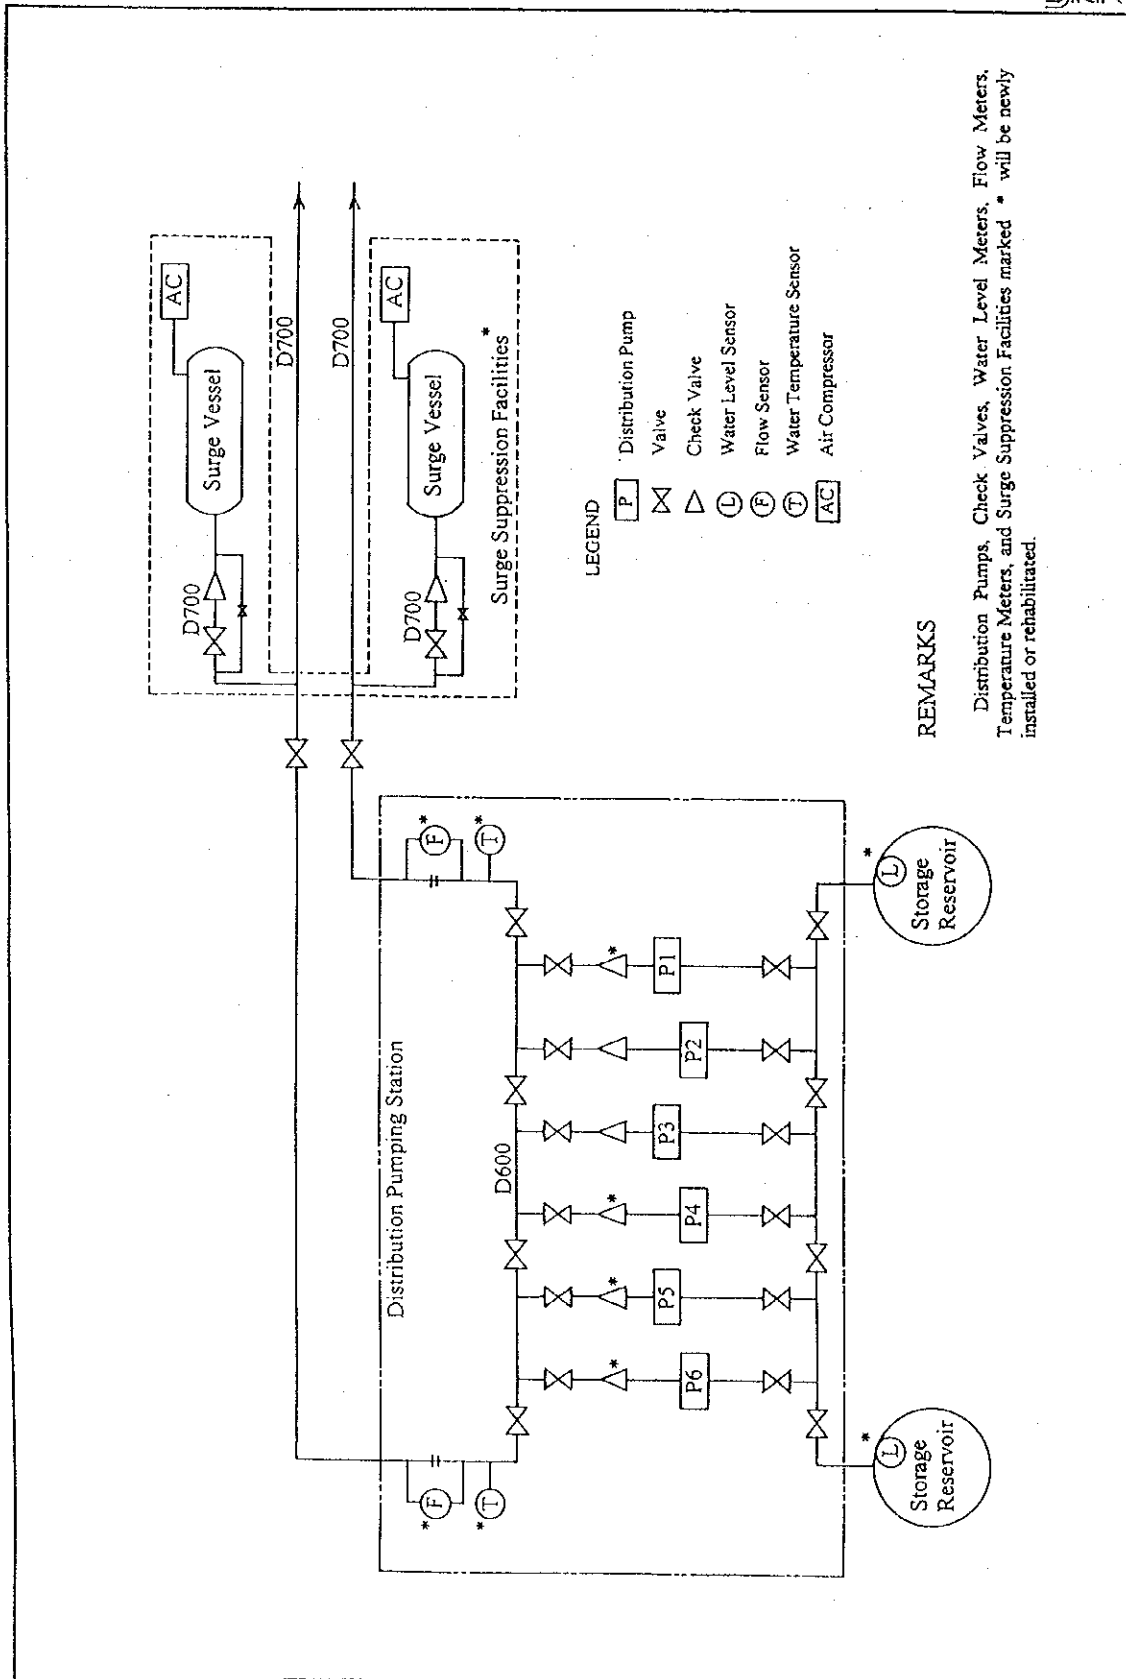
Improvement of Pumping Station at Upper Water Source
